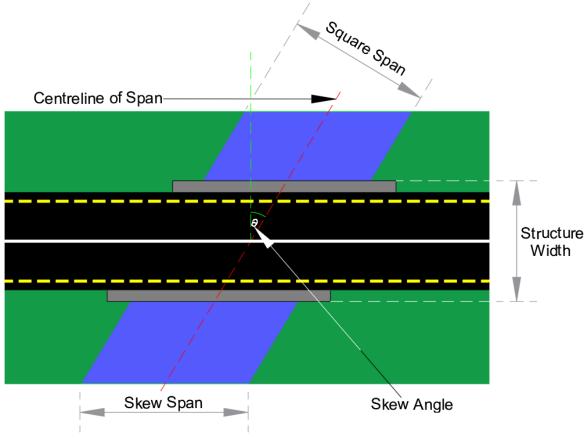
Bridge in Plan Depicting Skew angle and Spans
